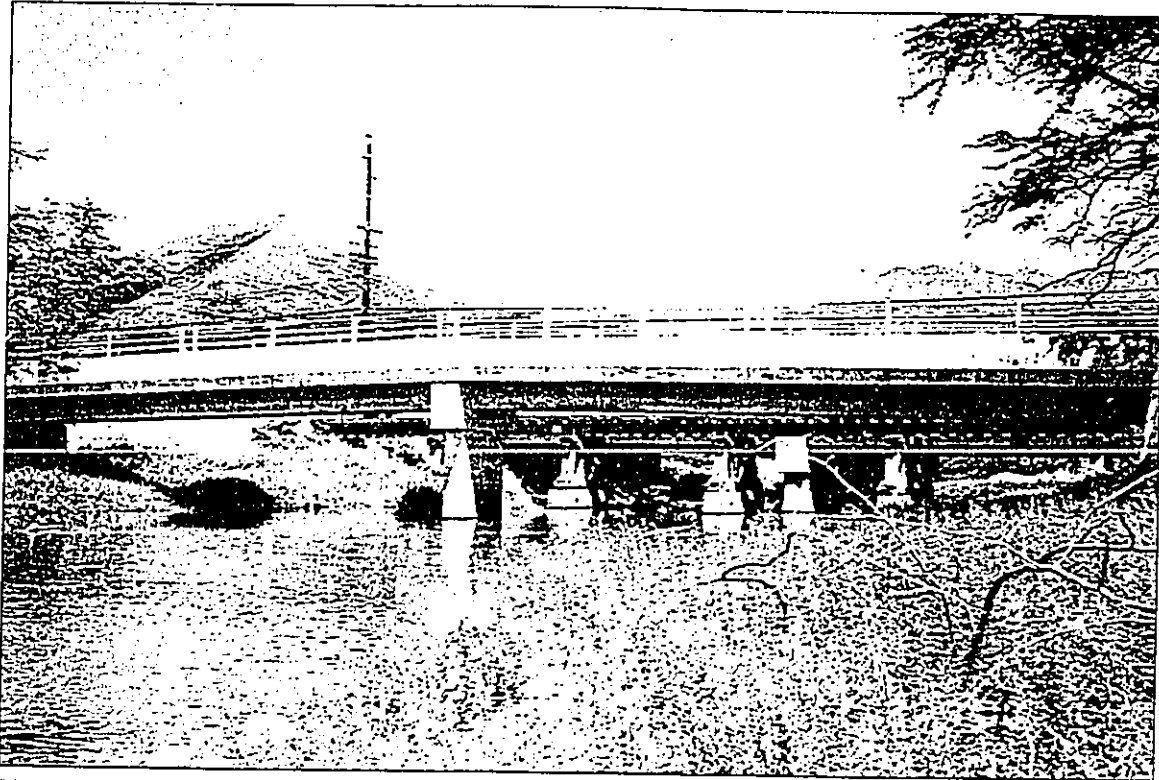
View of Nanakuli Stream looking mauka. Note the footings for the footbridge and road as well as the pickleweed and water of the muliwal.
